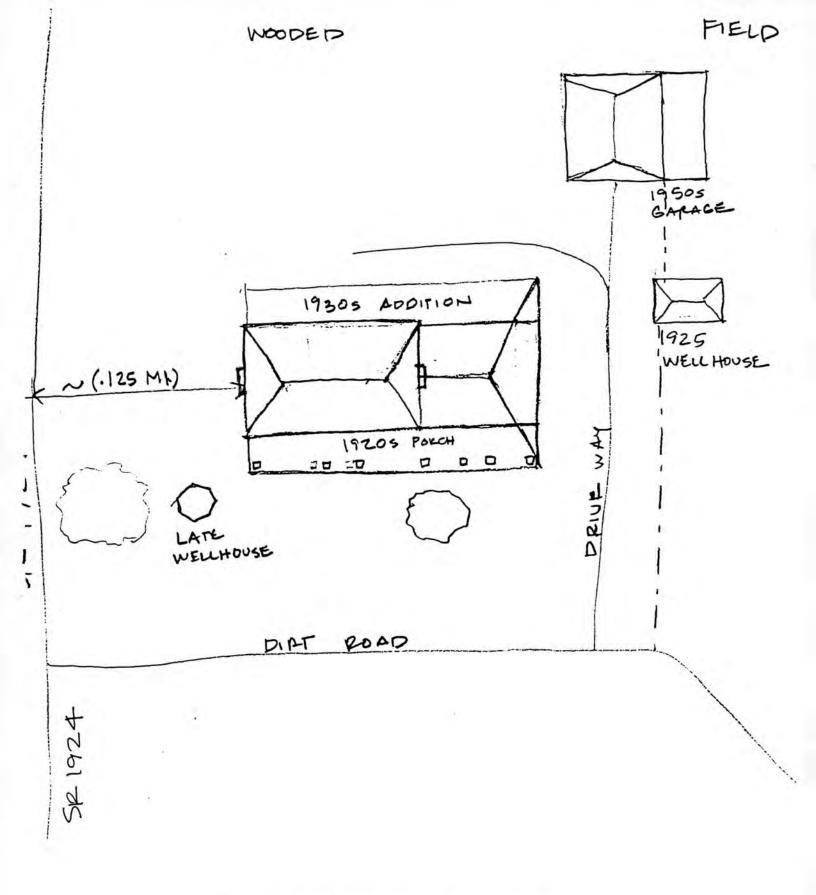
(R 05) JOHN COLETRANE HOUSE SITE PLAN (Not To Scale)
